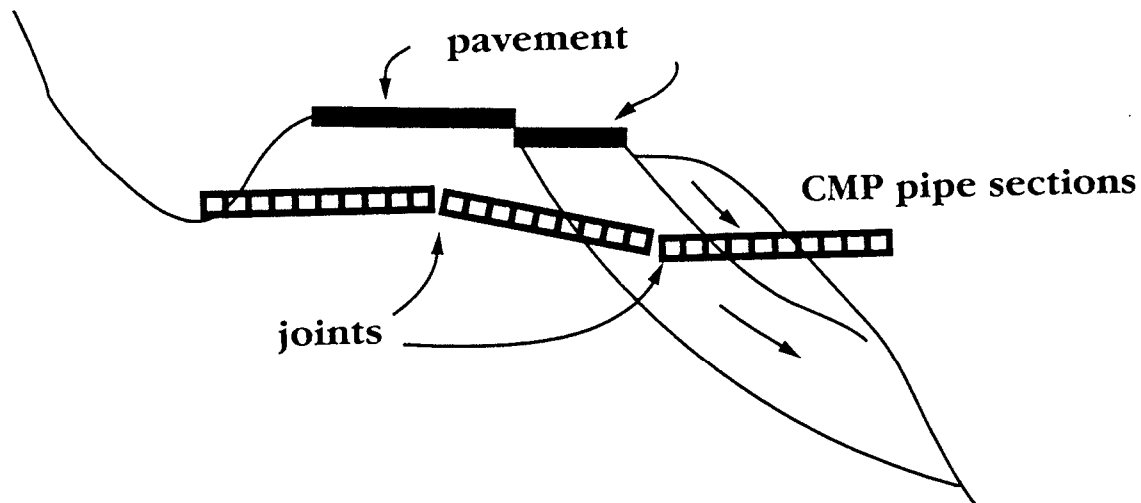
Diagram of Slump and Culvert Damage Beneath Spanish Ranch Road
